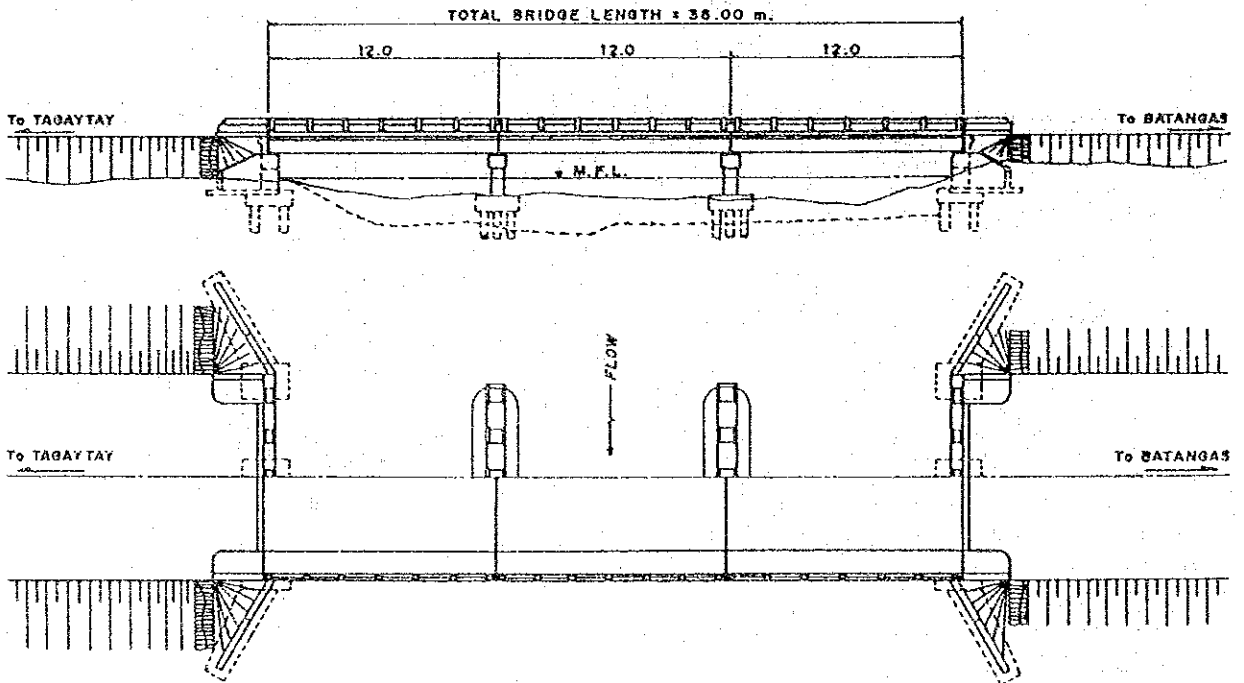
ELEVATION AND PLAN OF SINISIAN BRIDGE (BS-6)
